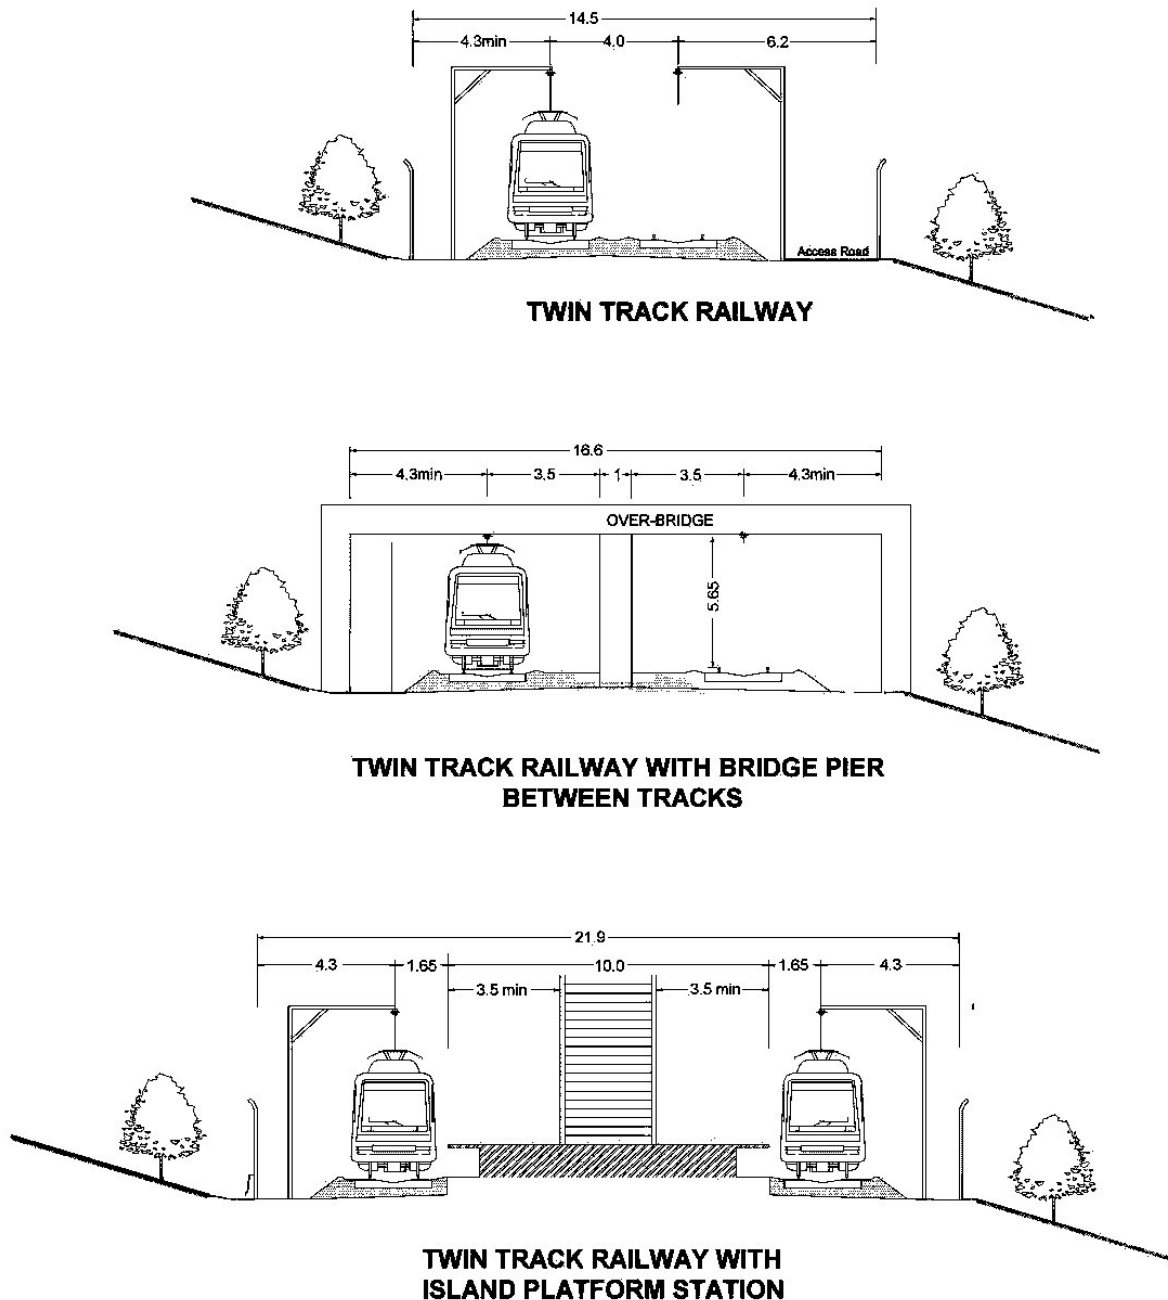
Typical Minimum Cross-sections for Heavy Rail
